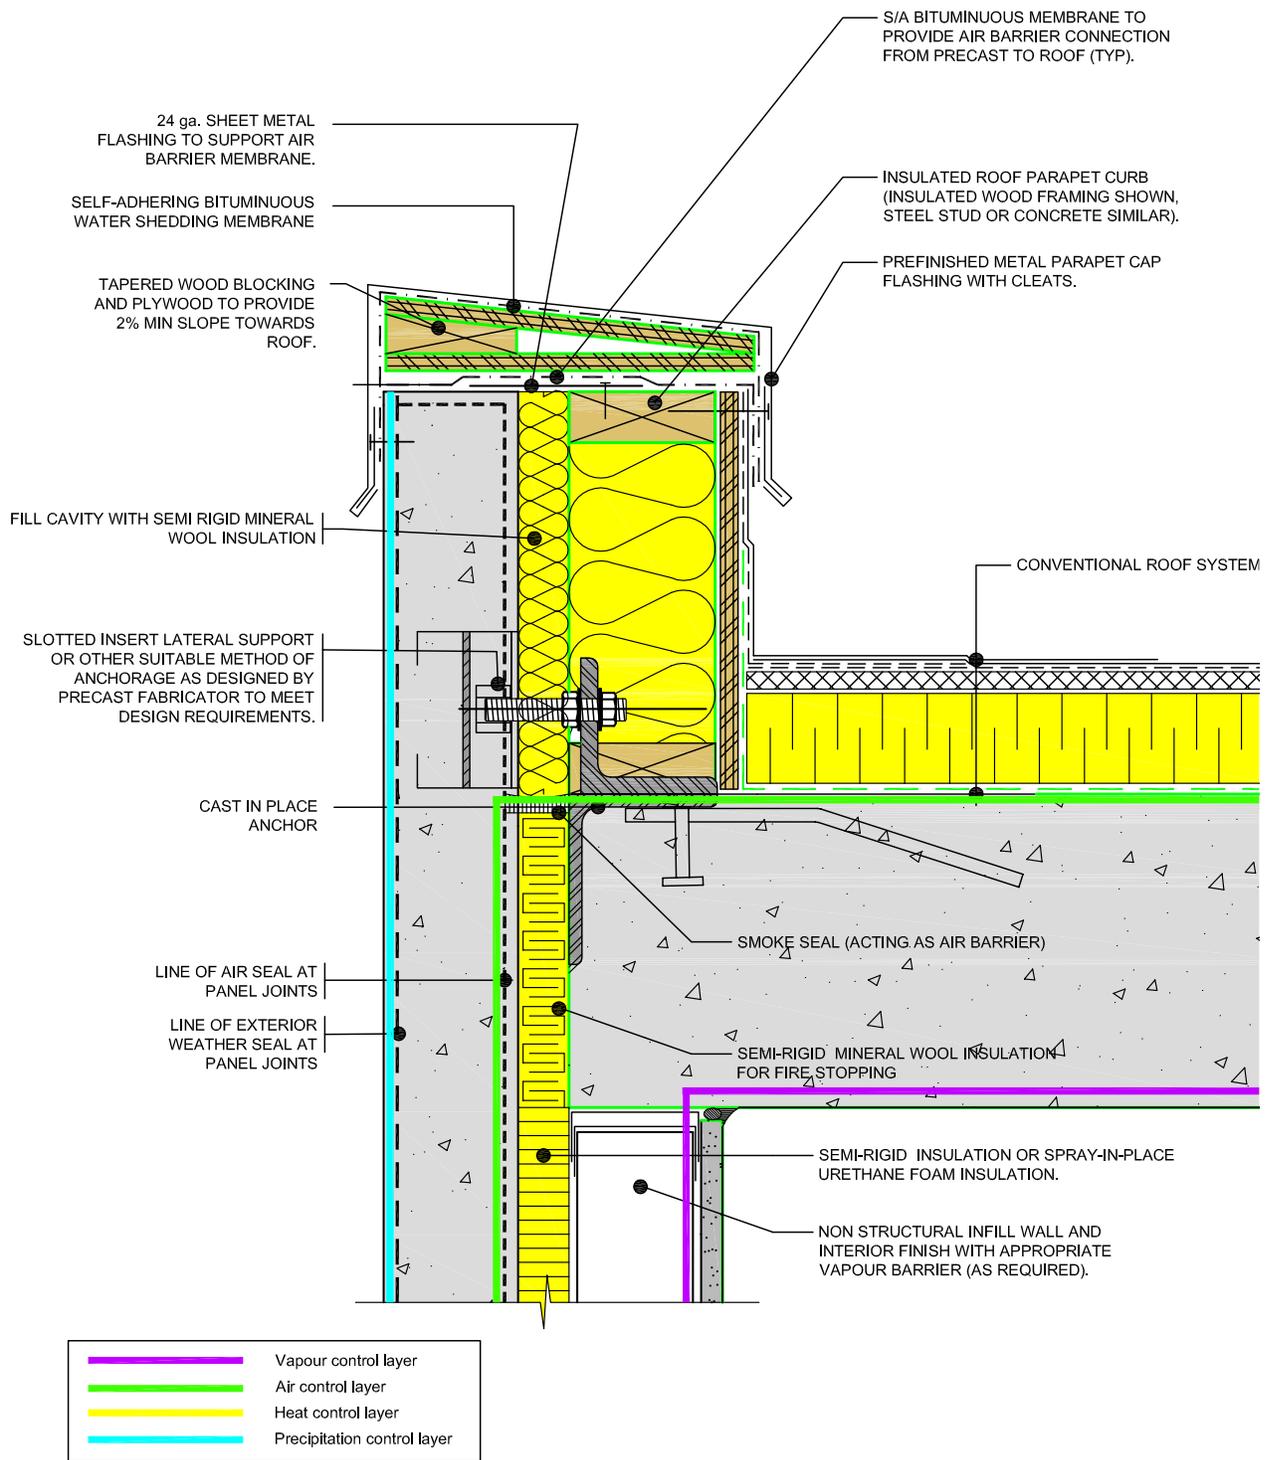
Single wythe precast panel—slab bearing connection. Source: M. E. Hachborn Engineering
